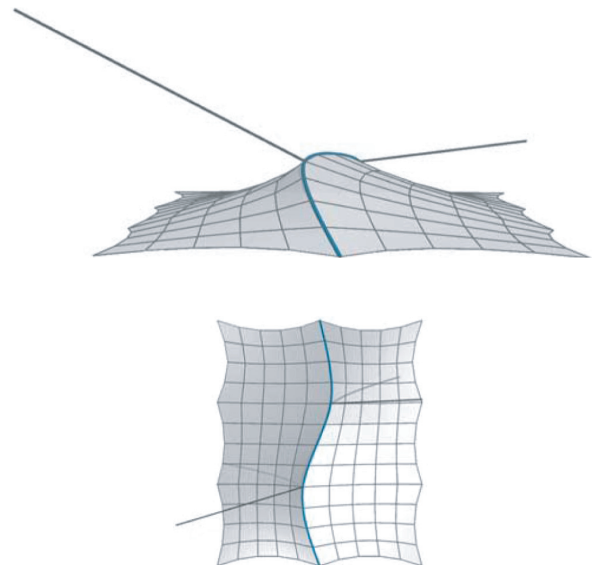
A bending element suspended by two cables connected, for example, to an adjacent building. The suspension cables pull the spline in opposite directions, creating a spatially curved arch.
